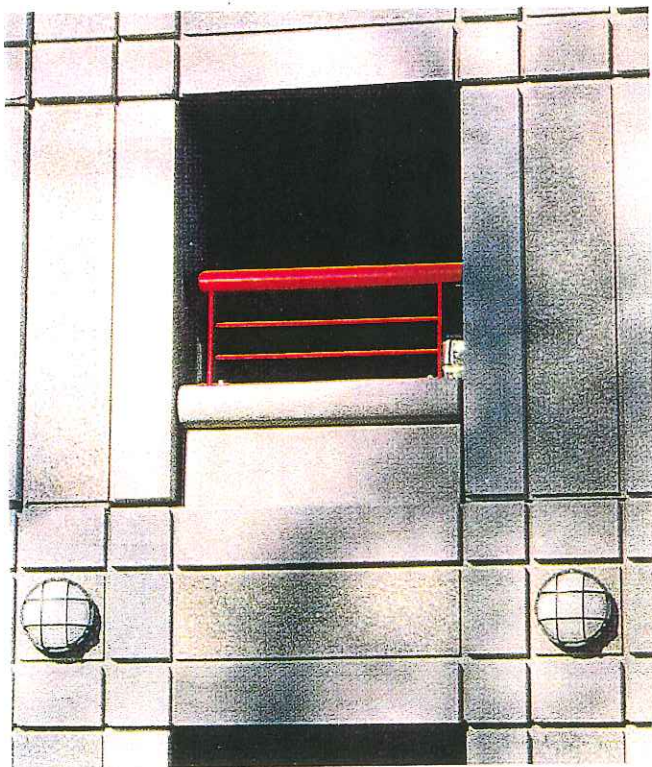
Closeup of architectural precast concrete detail at openings. Photo courtesy: Northeast Concrete Products.
